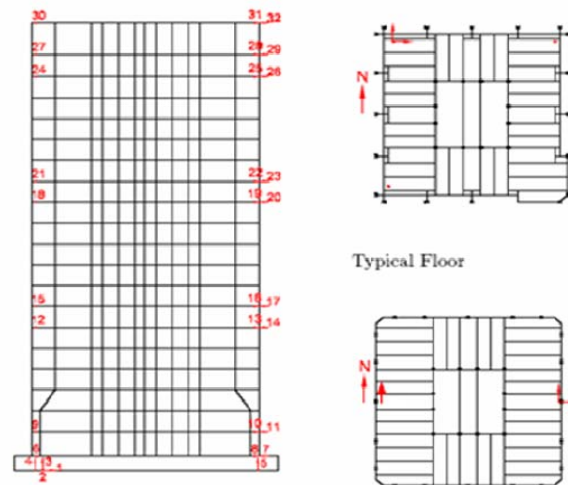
Elevation and plan views of Atwood Building with accelerometer locations indicate.
